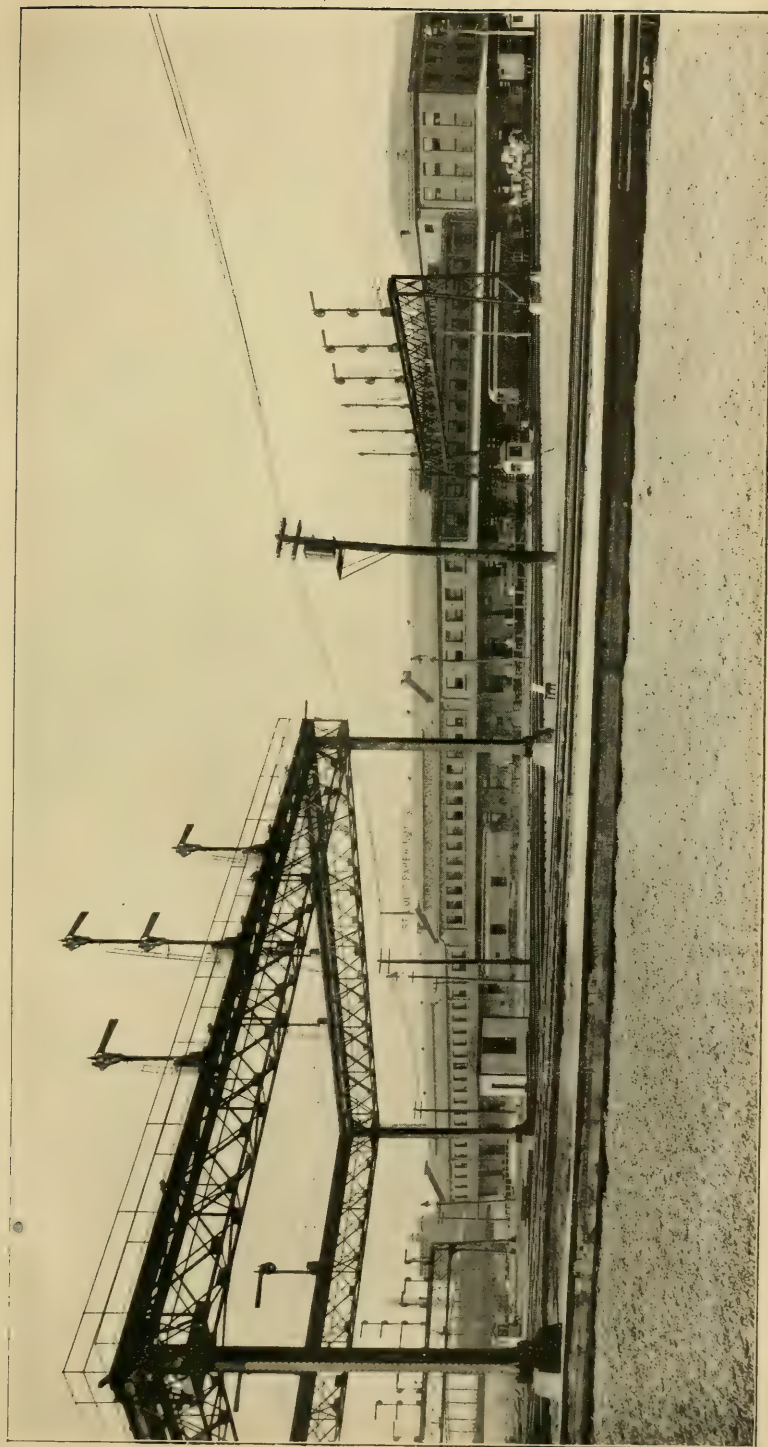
EXPRESS BUILDINGS AND SIGNAL BRIDGES.
